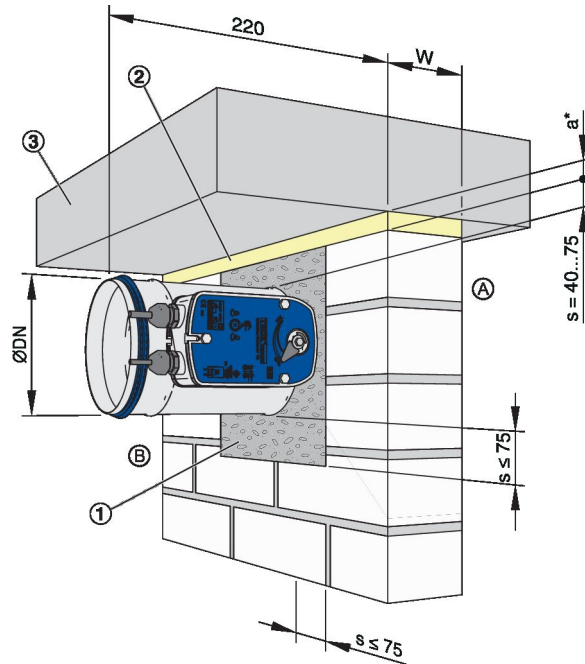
Mortar-based installation in a solid wall with flexible ceiling joint
